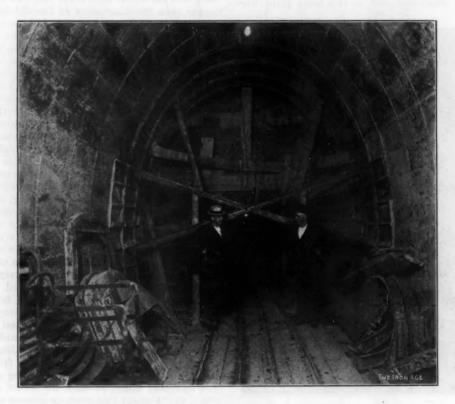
Method of Lagging and Concreting the Large or Trunk Tunnels.
